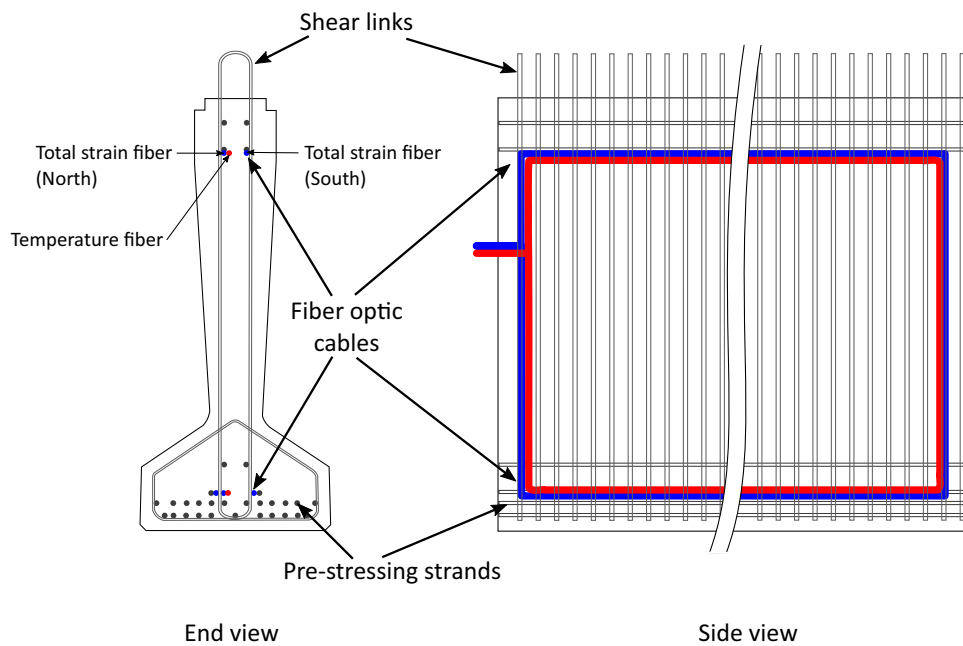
(Color) Beam cross section showing fiber-optic cable locations (adapted from Hoult et al. 2009)
